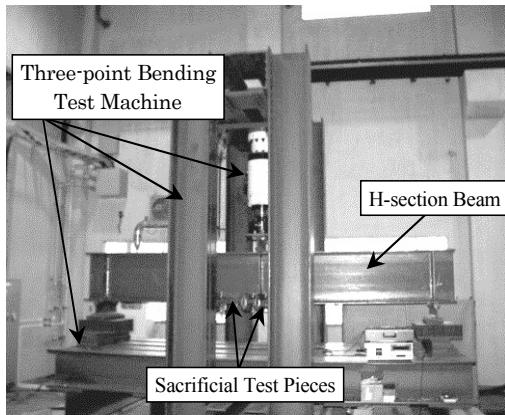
Constant amplitude loads test using by three-point bending fatigue test machine
